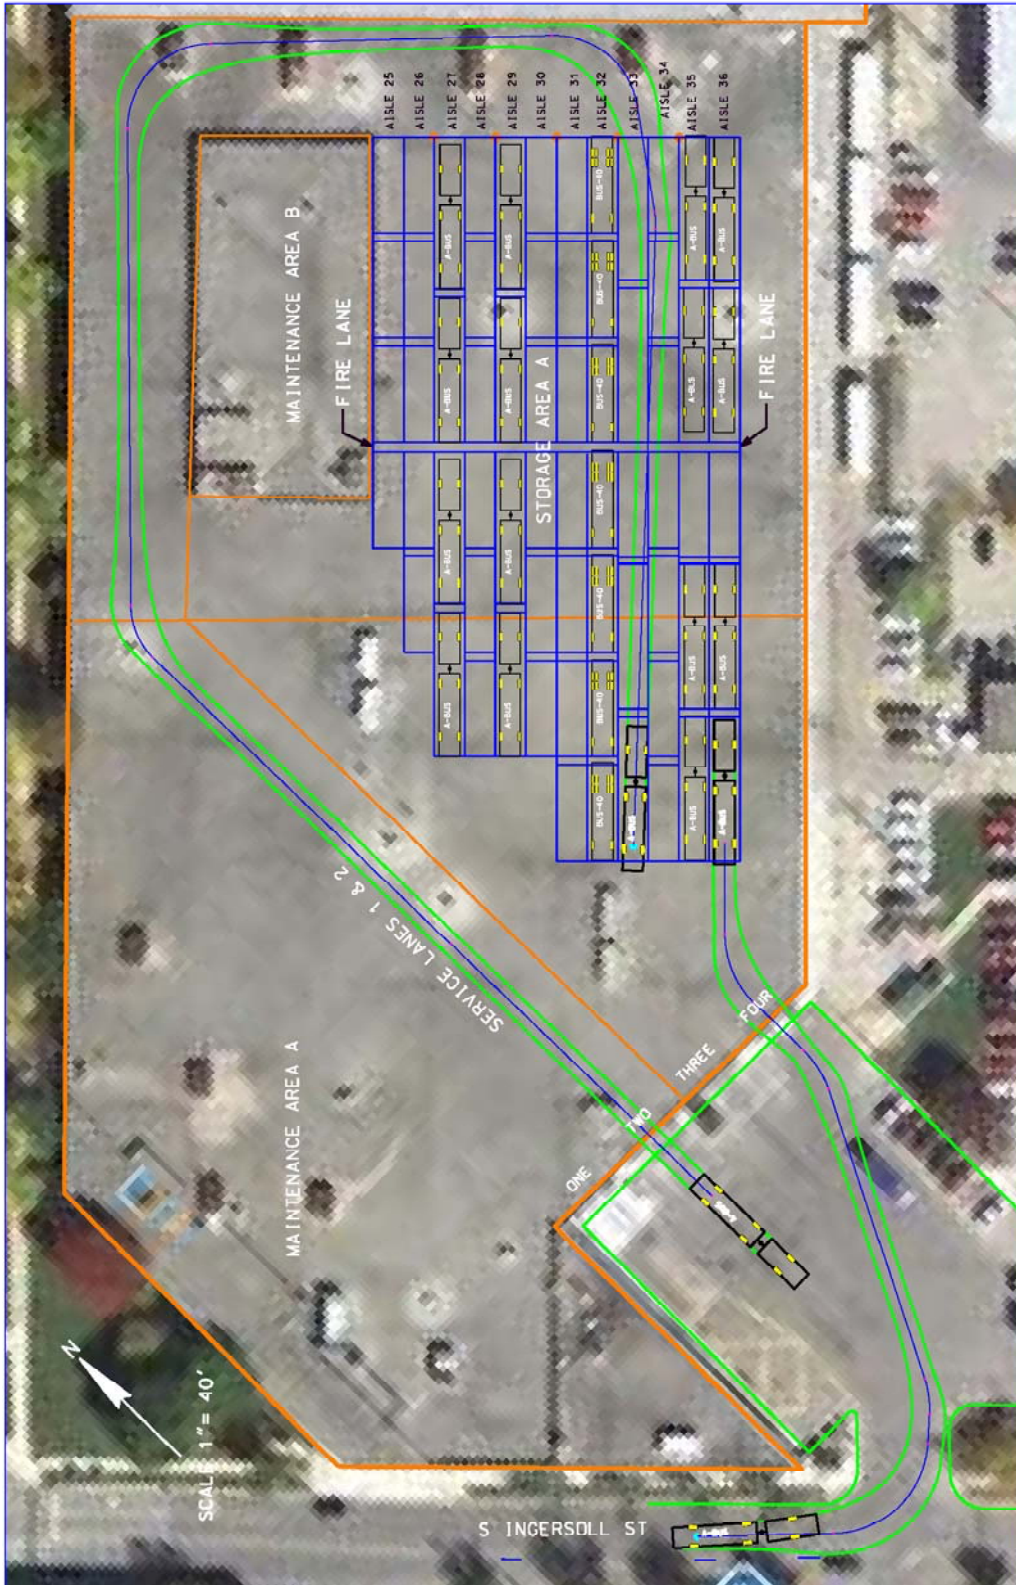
Exterior Travel Pattern – Exiting the Building; Interior Travel Pattern – Route to Storage Area A; Storage Options
